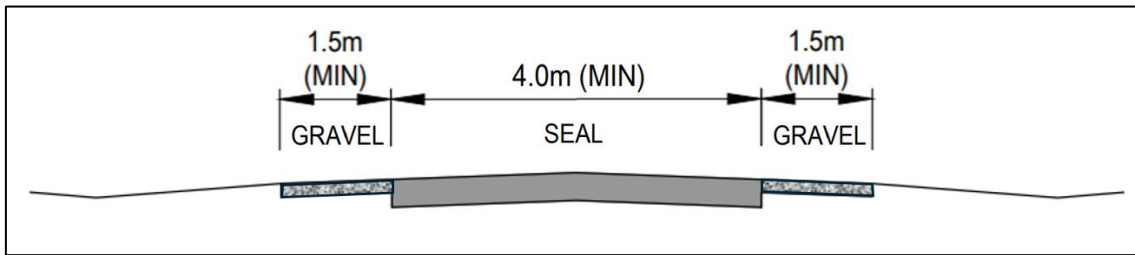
Chrystal Road – Proposed cross section (eastern section)
